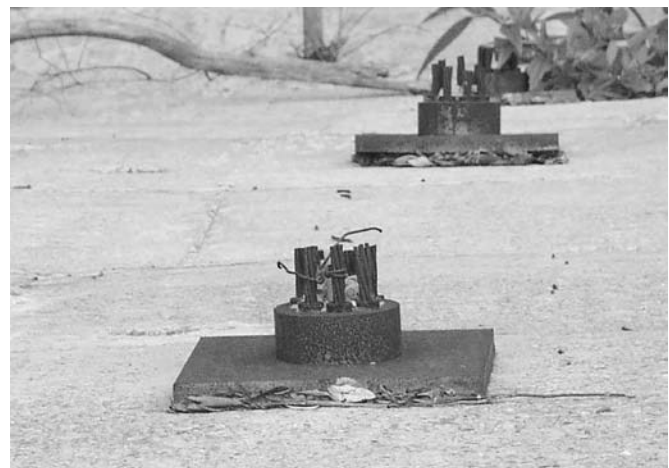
Corrosion of locking unit (anchor head, wedge, bearing plate)
